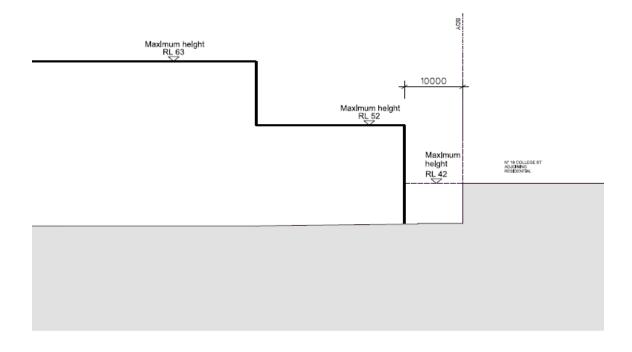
Section D Setbacks to neighbouring residential property at 18 College Street
